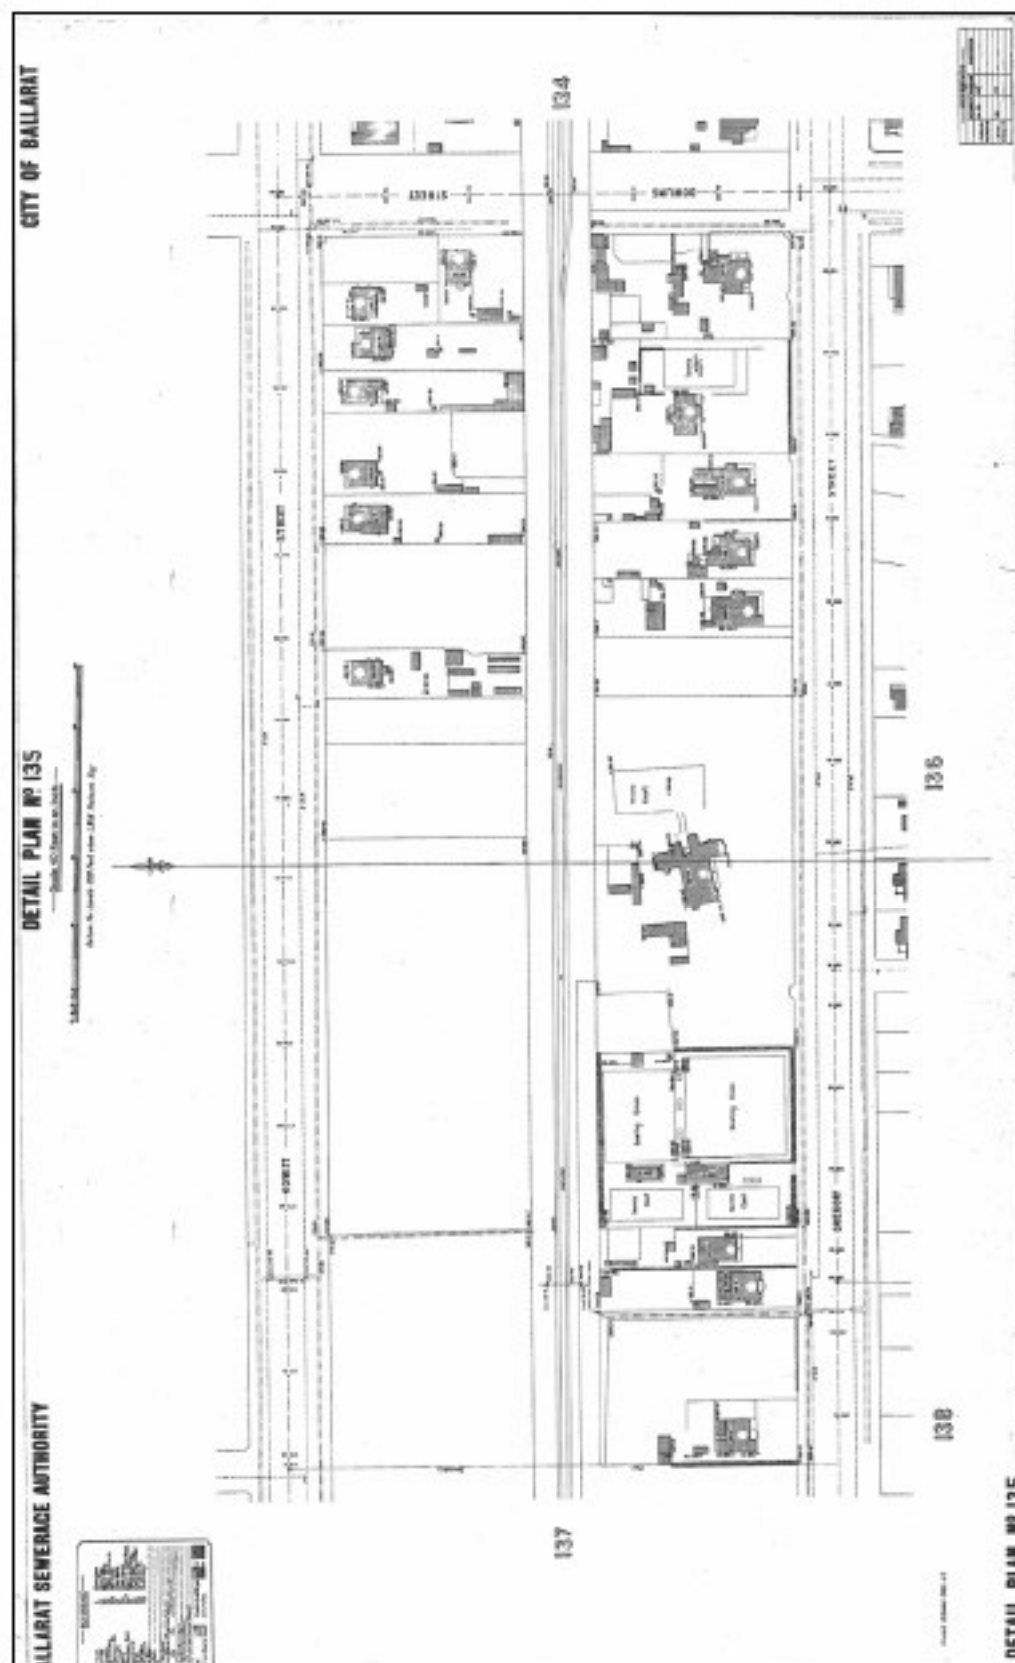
Ballarat Sewerage Authority Plan, 1933. Source: Planning Department, City of Ballarat.
